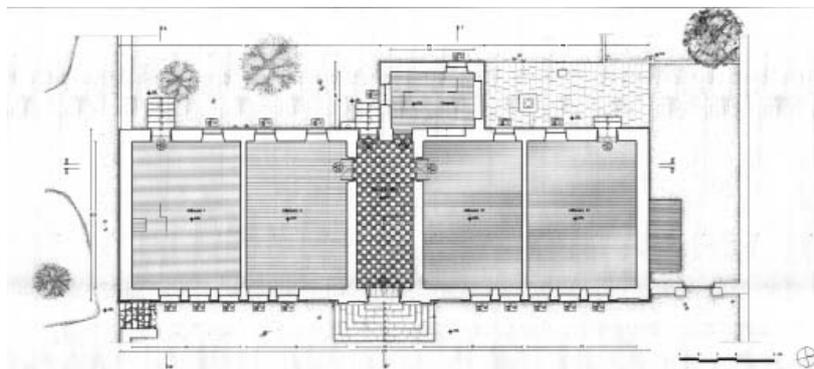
Primary School at Mastoratika. Ground Floor Plan.
